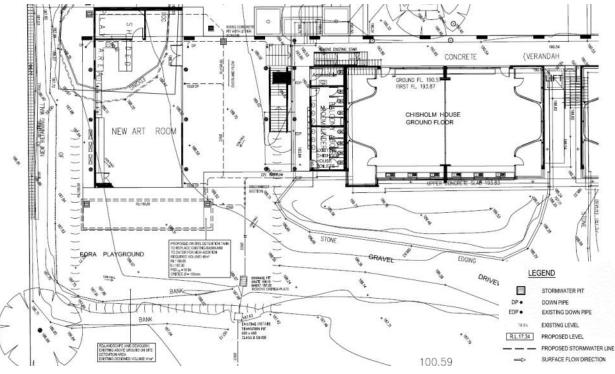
Extract of Proposed Stormwater Plan (Source: CMP Engineering)
